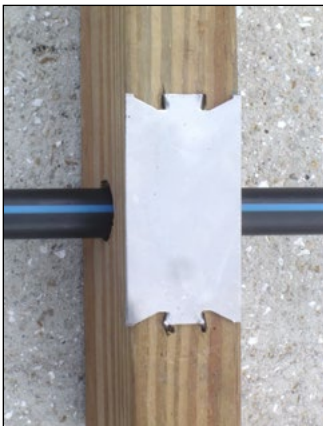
Nailing Plate Installed on Wood Stud to Protect PEX Tubing
